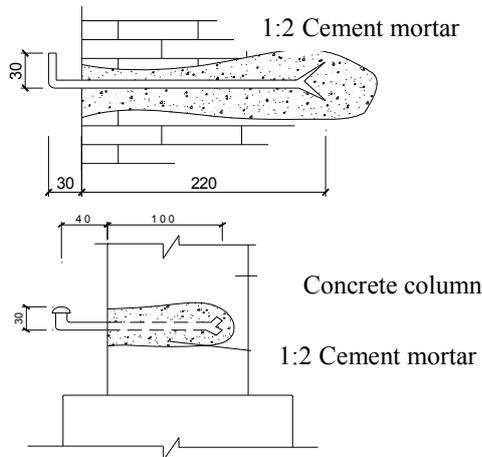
Schematic diagram of the surrounding buildings embedding measuring points (unit: mm)
